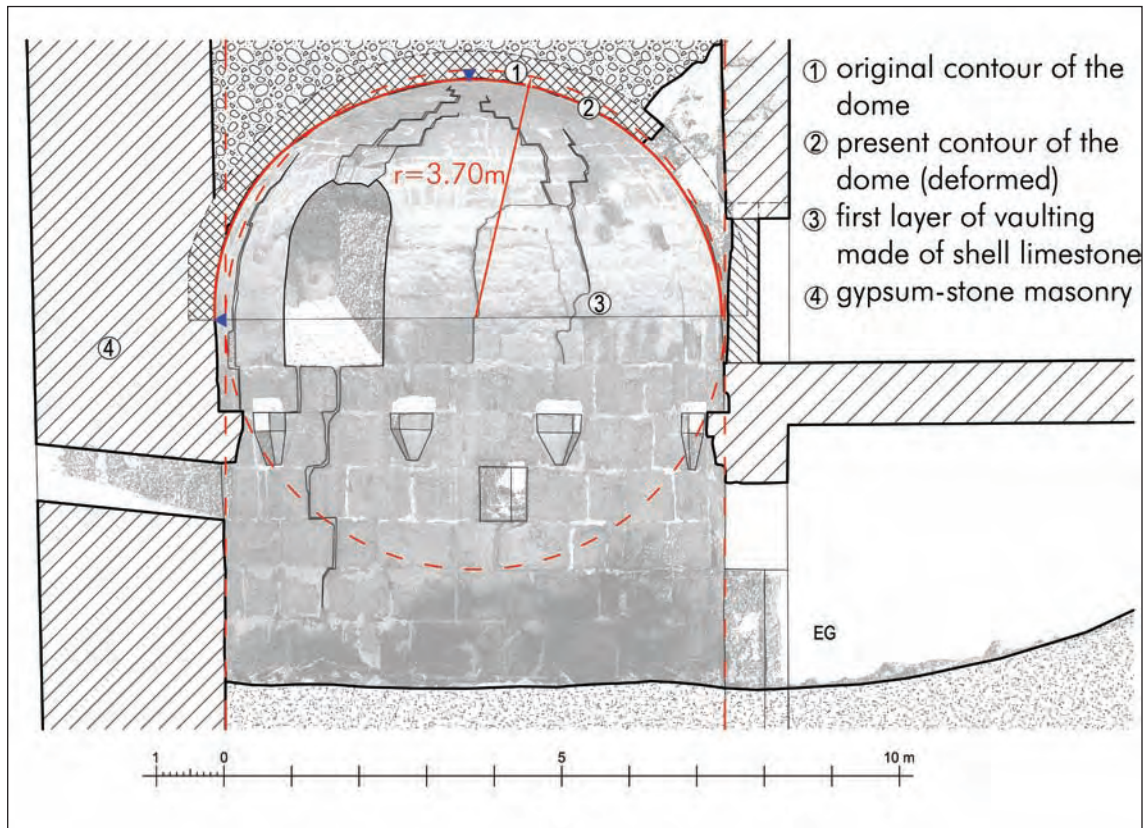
Resafa, City wall, tower 36, cross-section with orthophoto derived from TLS-generated point cloud, view to the north (C. Hof/ N. Erbe, 2010).
